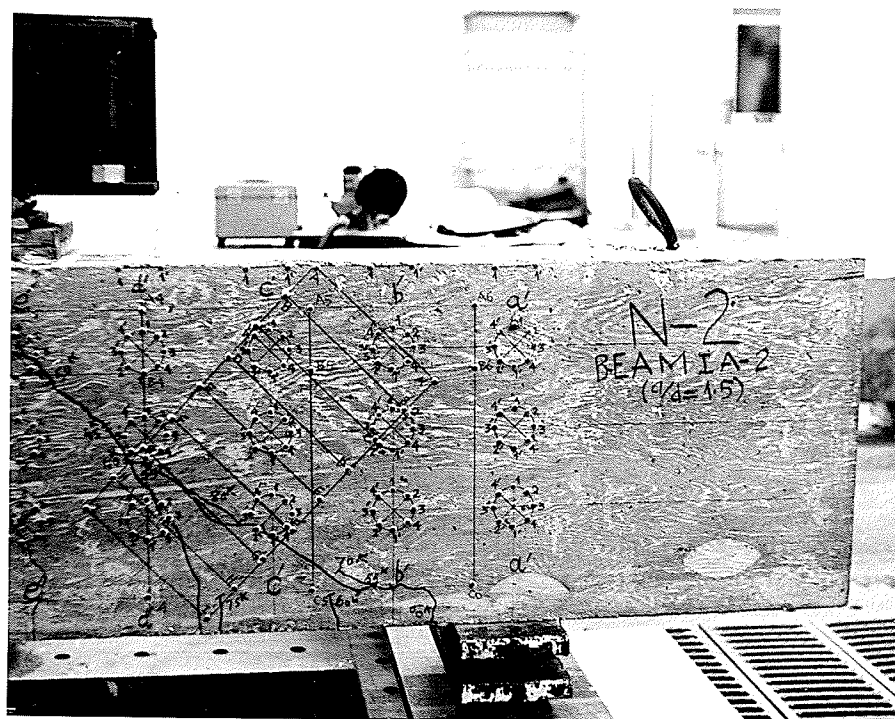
CRACKING AND DEMEC GAUGE LOCATIONS ON BEAM IA-2
